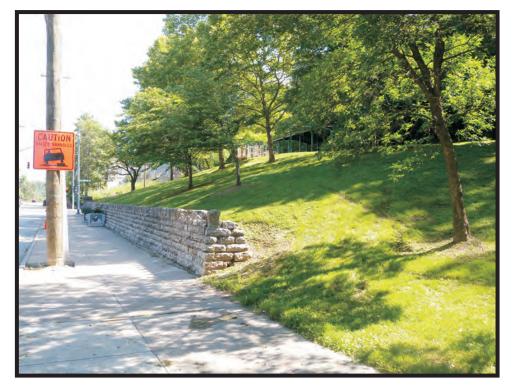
Stone wall along West McMicken Avenue at West McMillan Street, facing north.
